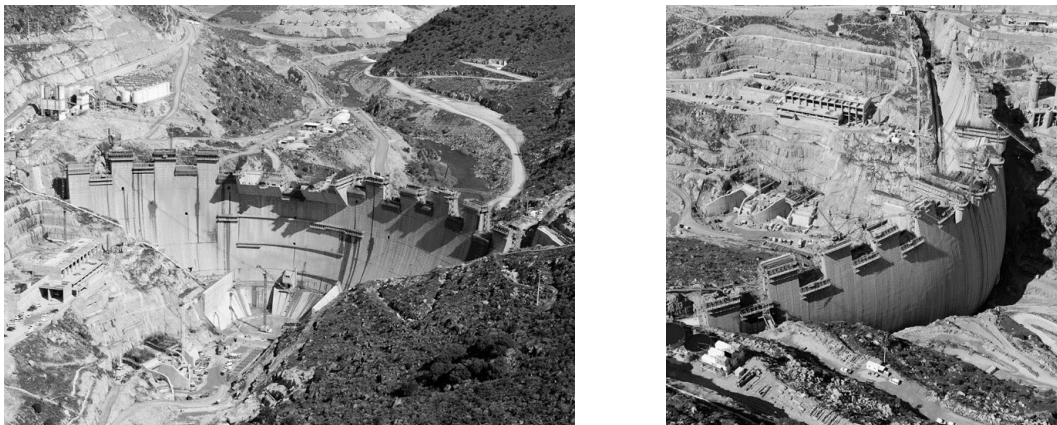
Construction of Baixo Sabor Dam (August 2012).
